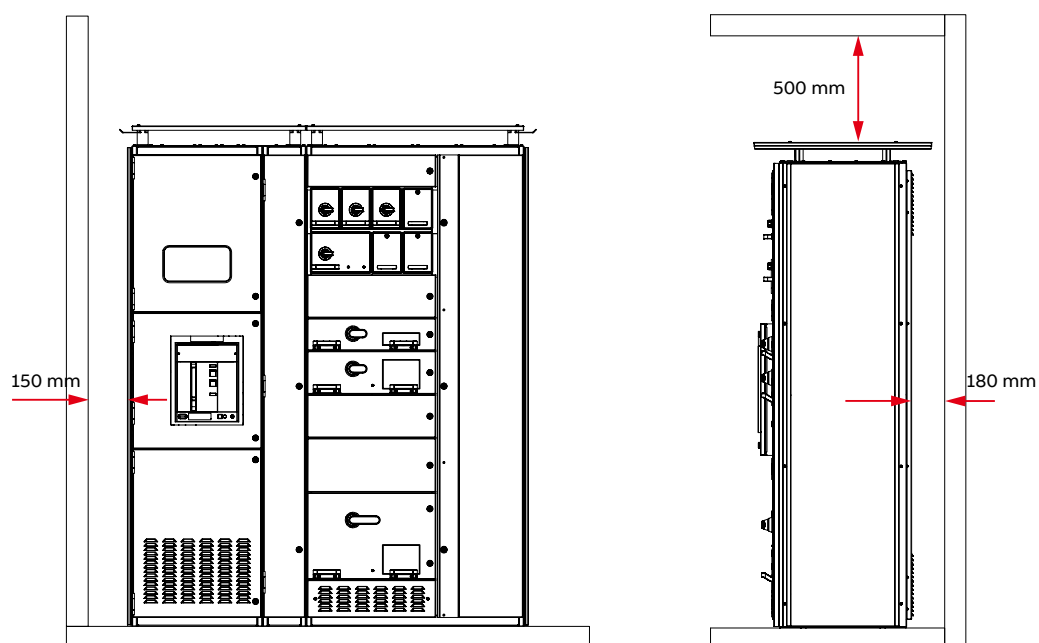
Section minimum clearances for raised roof plate IPx1/IPx2 with left mounted doors
